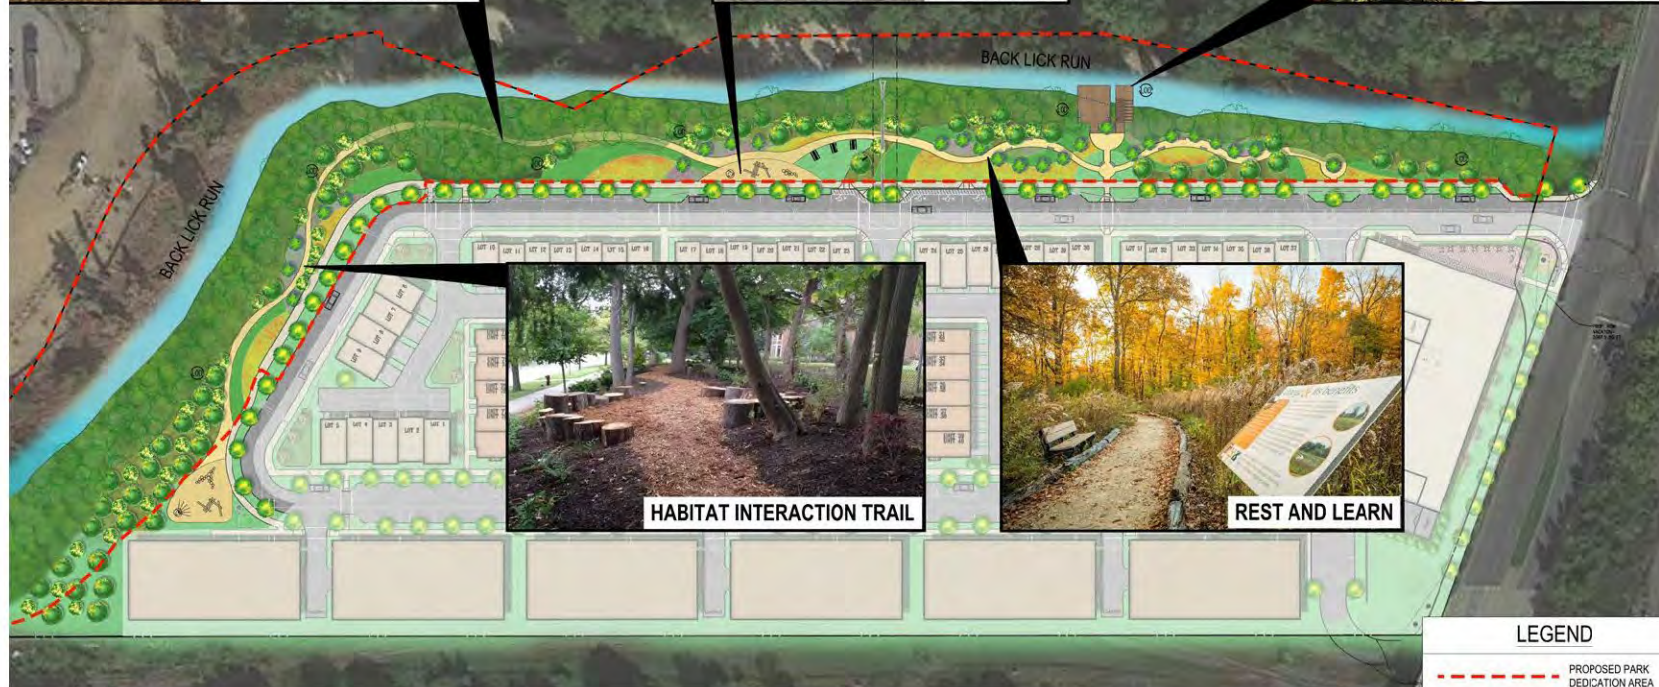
DETAIL PLAN: BACKLICK RUN PARK (NORTH)
